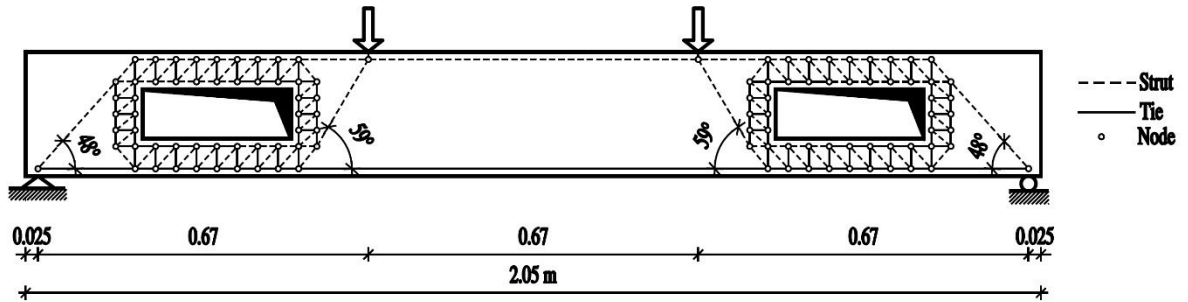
STM of a simply supported beam with two opening [El-Dermerdash et al. (2014)]
